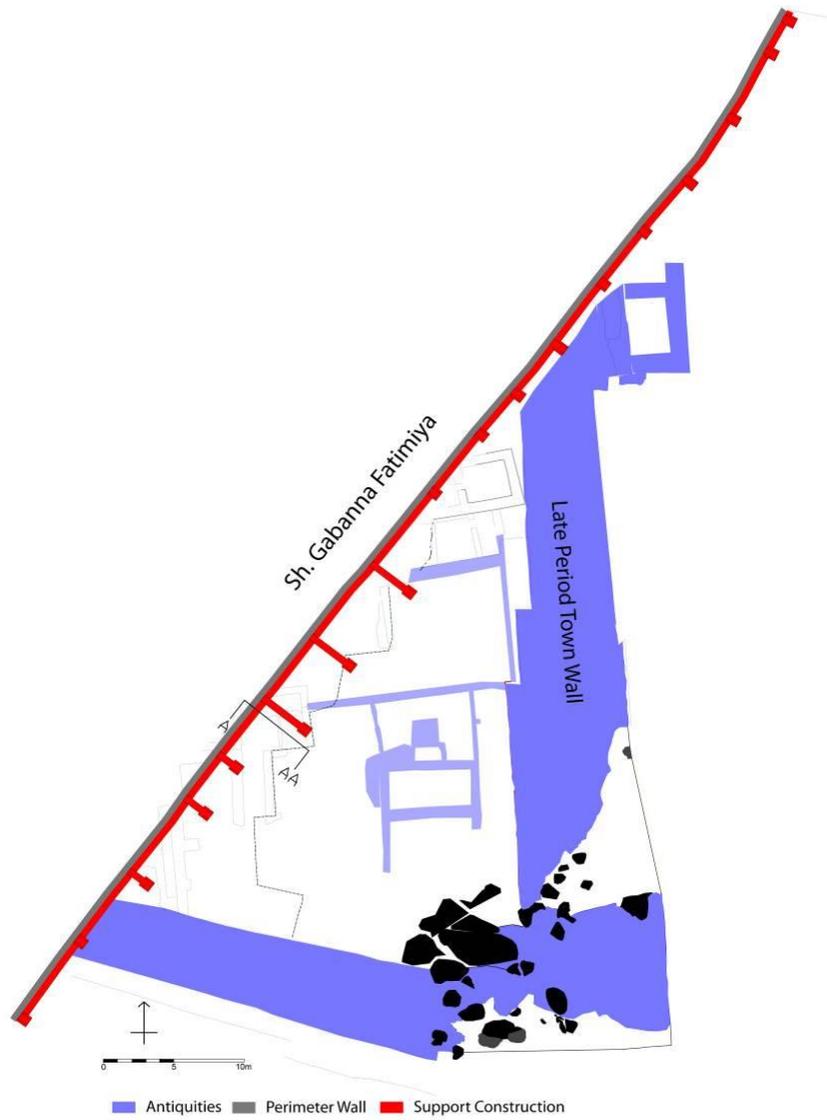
Area 2: Plan of the reinforcement of the western perimeter wall.
